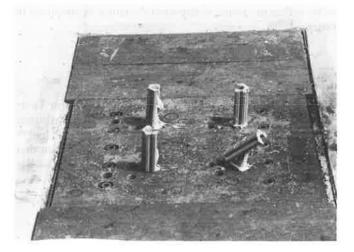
Typical coupling fracture pattern, automobile impact.
